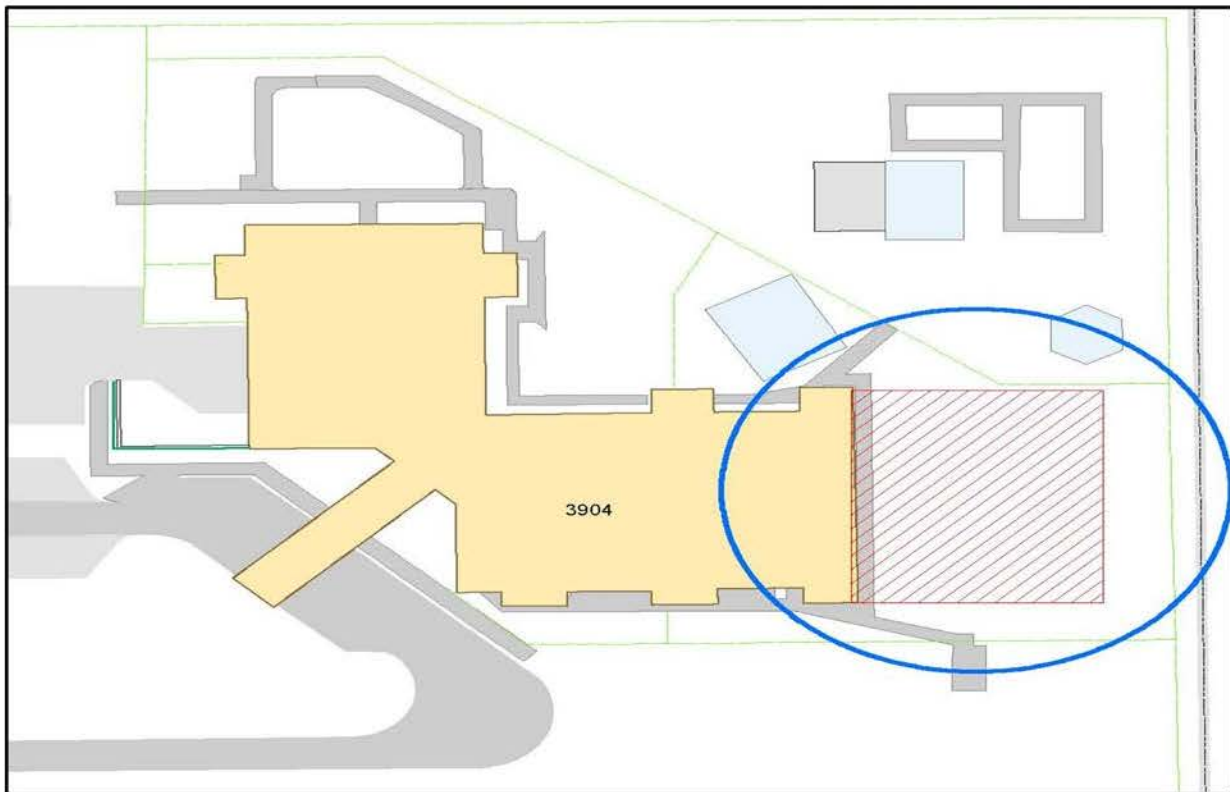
Proposed Location of Addition, CDC East, Building 3904
